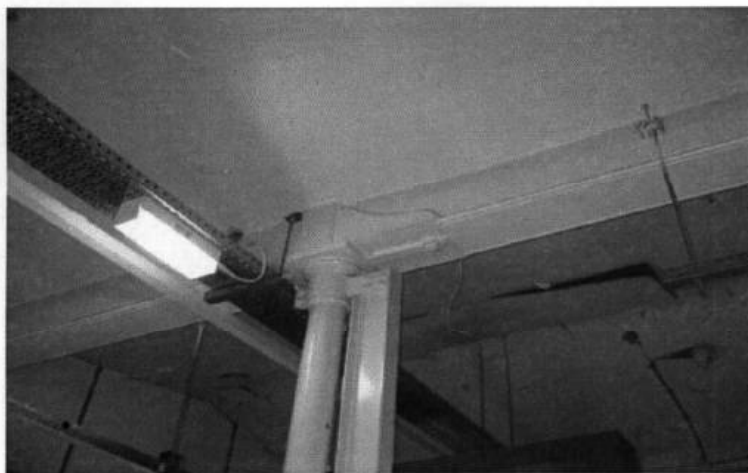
detail of second floor plastered ceiling, column and beam (Block B)
